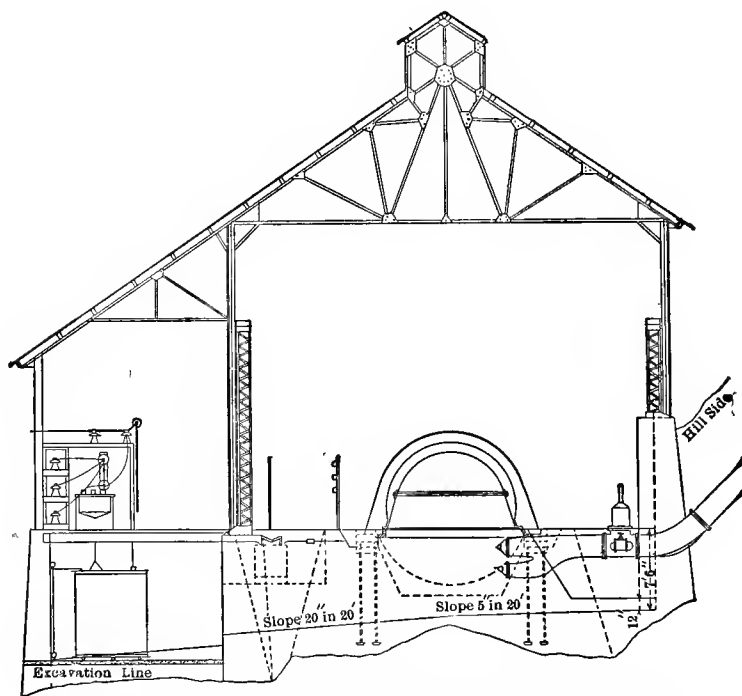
SHOWING GENERAL ARRANGEMENT OF POWER-HOUSE.
